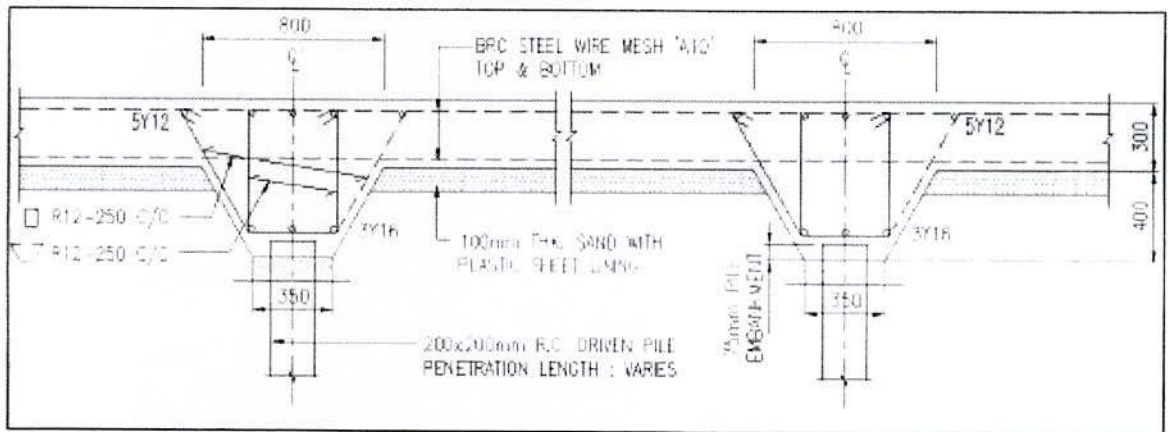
Typical section of the strip-raft foundation system (after Tan et al., 2004).
